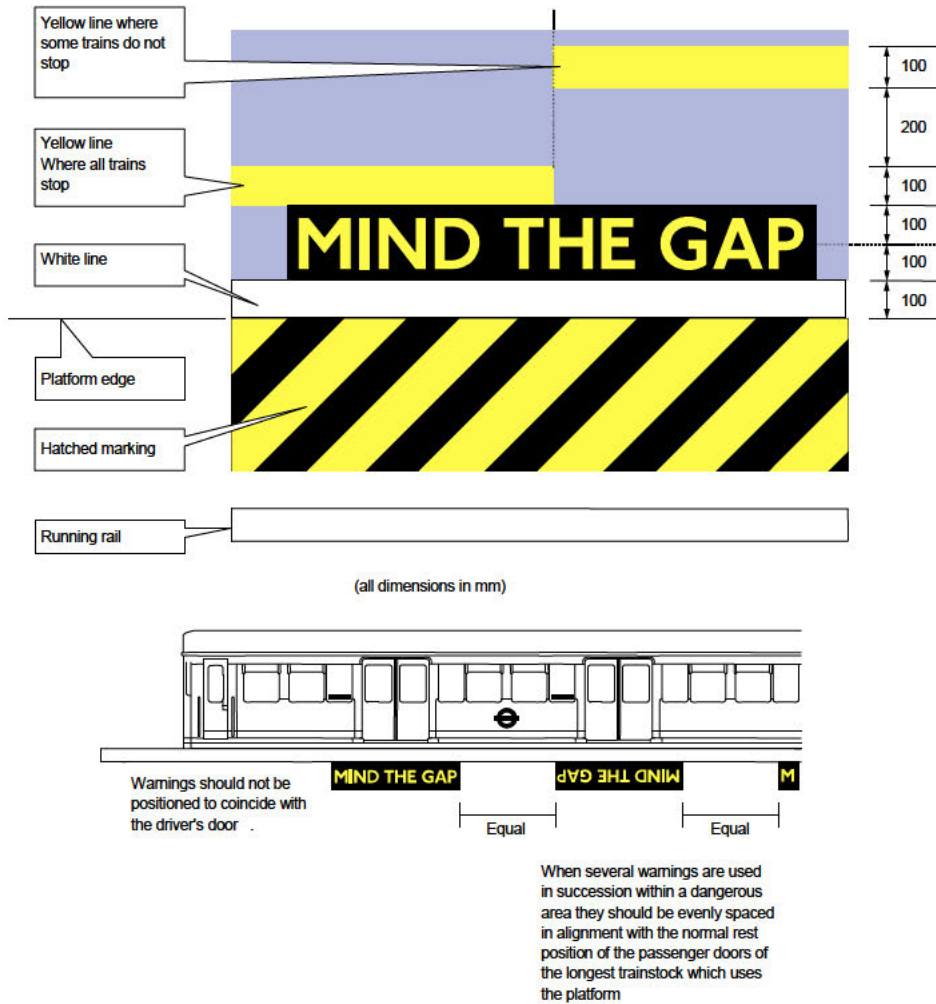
Plan of yellow lines and layout of “mind the gap” warnings
